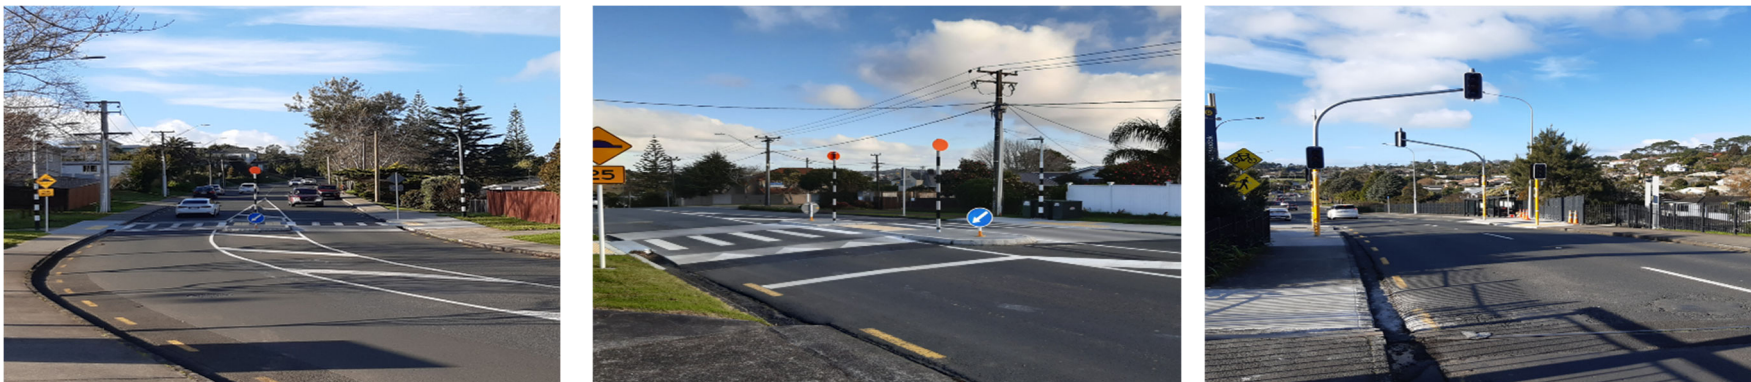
New pedestrian crossings installed on Sunnynook Road, Sunnynook
